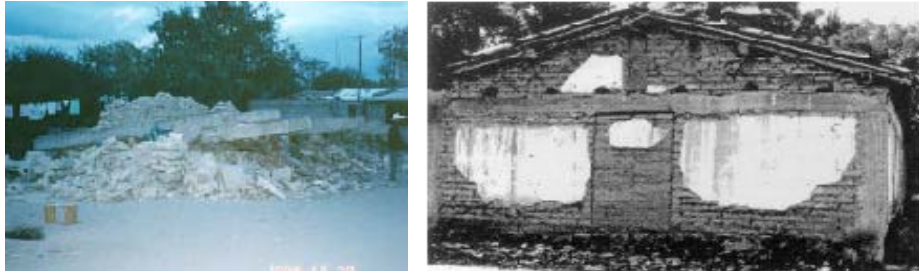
Unreinforced collapsed house (left) and Confined adobe house (right) after the 1995 Omotepec earthquake (EERI, 1995).
